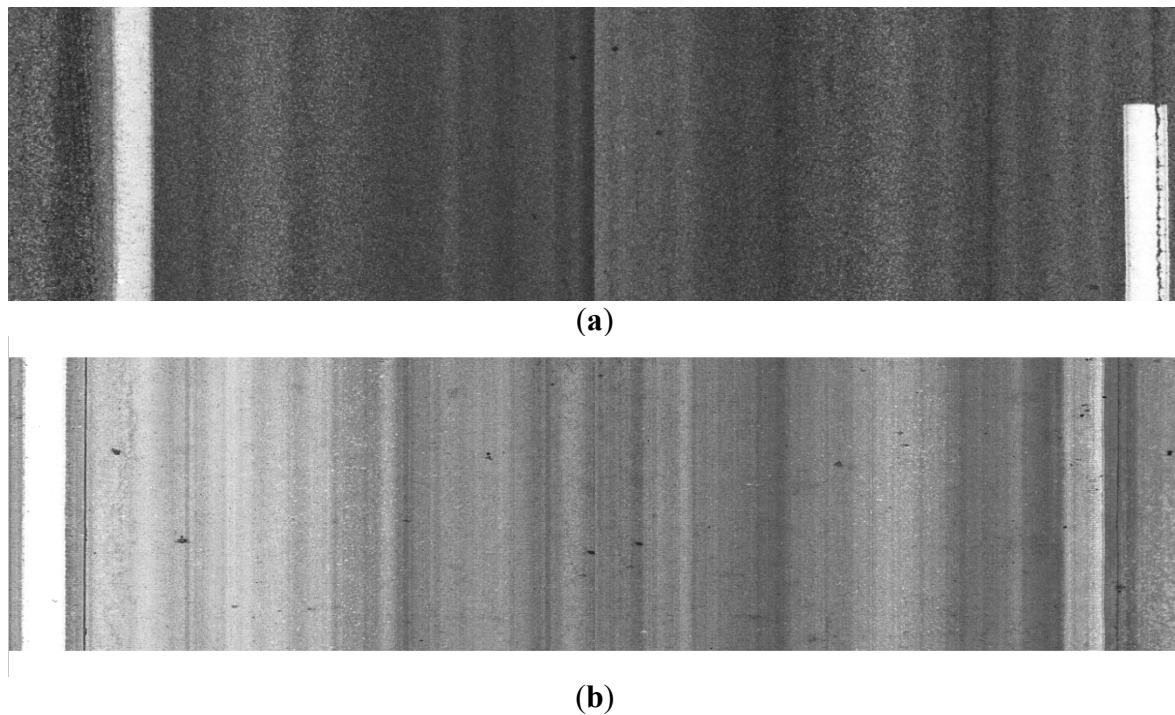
Pavements: (a) flexible pavement, (b) rigid pavement.
